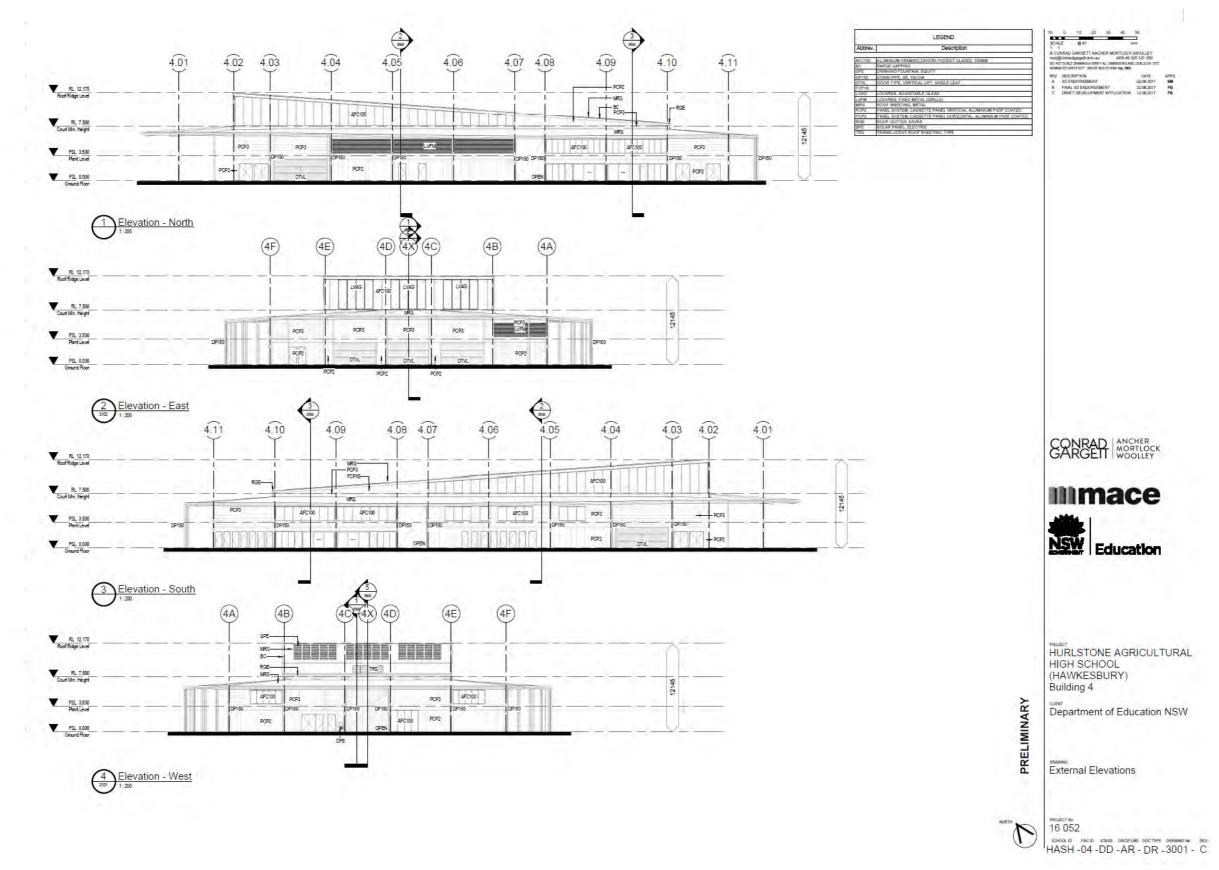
Proposed Sections Building 4 Can'ad Gargett Ancher Mortlock Woolley (2017) HASH04-DD-AR-DR-3001-C
